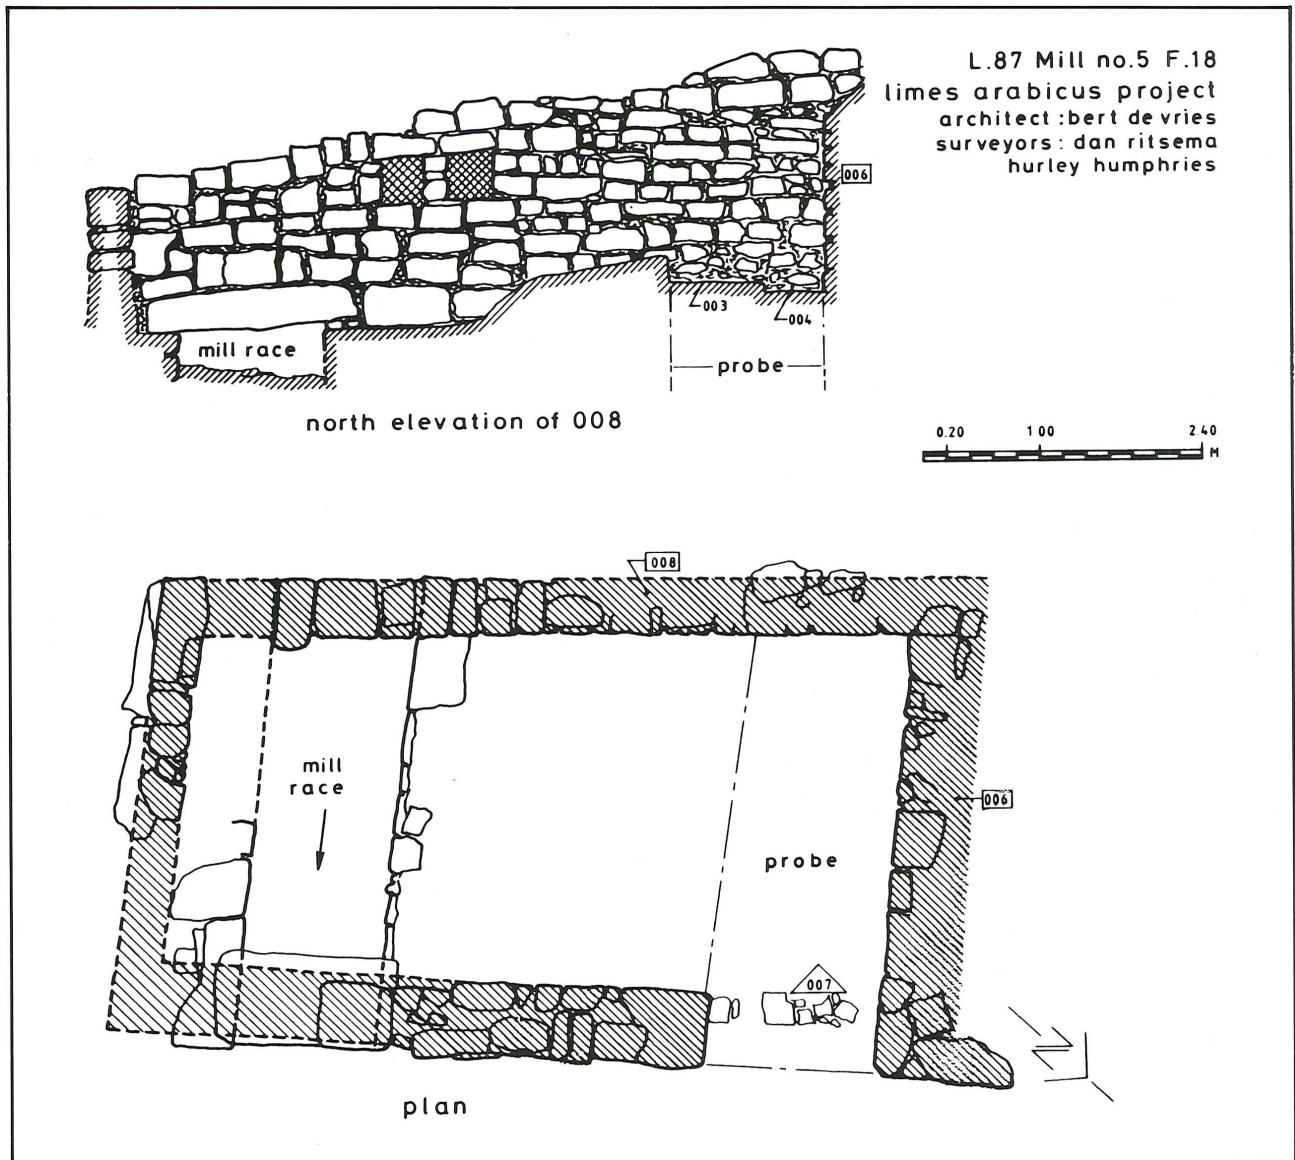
Plan and elevation of Mill No. 5 in the Wadi Lejjun.
